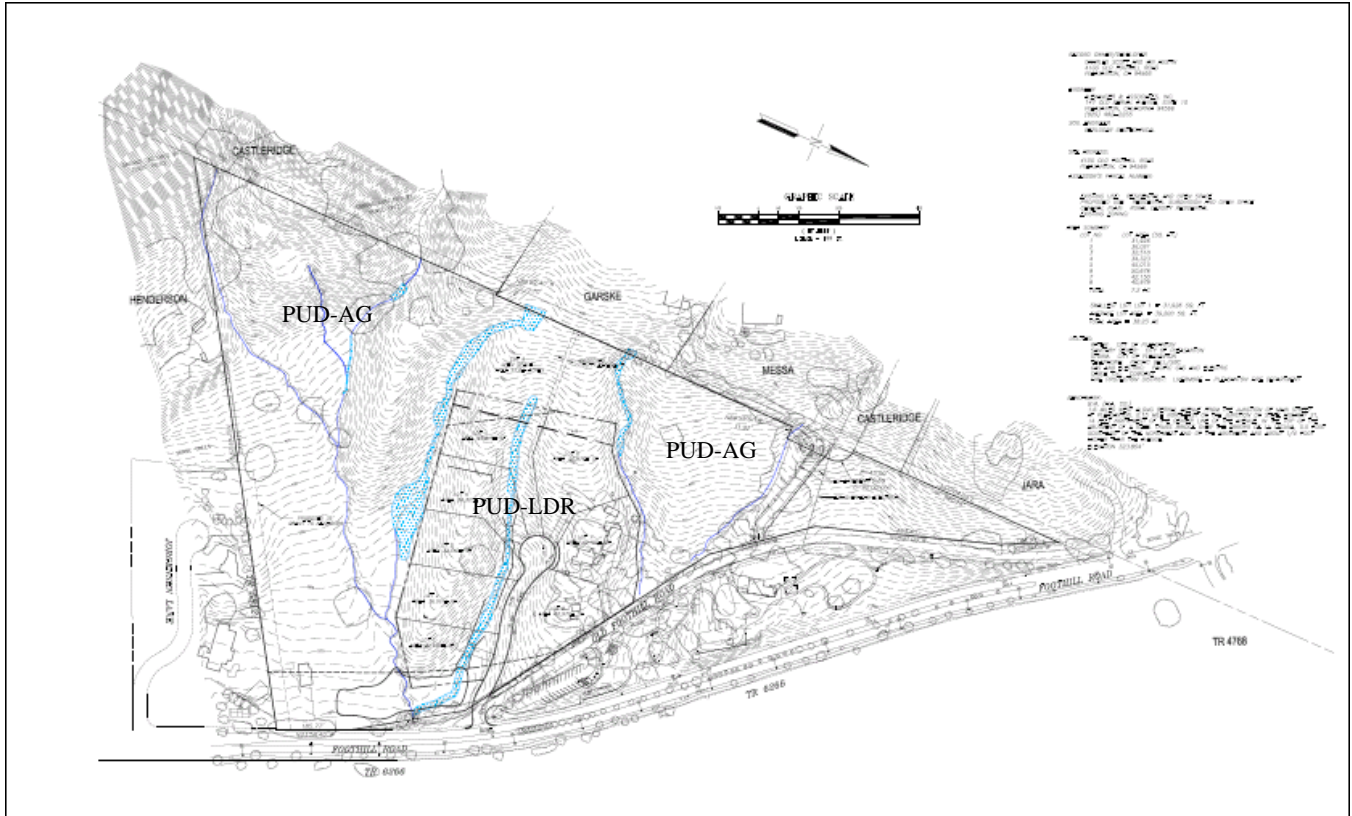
Exhibit “D”, Proposed General Plan Amendment Map
